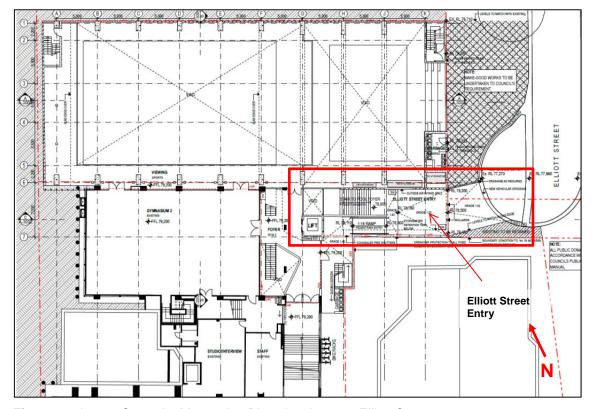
Lower Ground 2 Mezzanine Plan showing new Elliott Street entry
